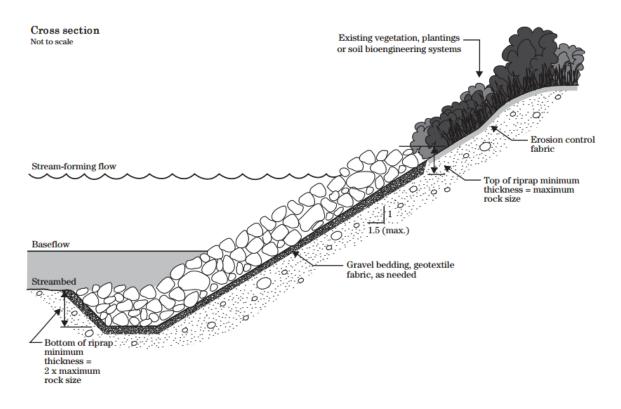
Typical riverbank riprap protection detail (from USDA NRCS Field Engineering Handbook Chapter 16)
